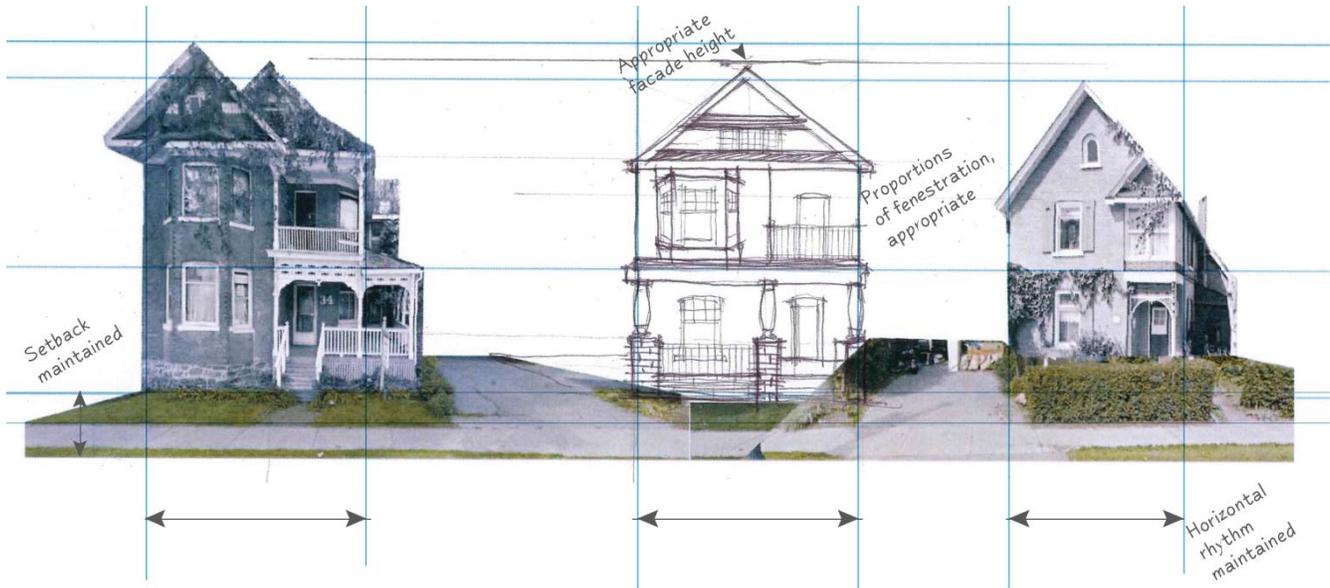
New Building Proportions, Height, Setback, and Style, Example is Supported. Example of new building that uses details from Edwardian Style, while also considering and respecting existing setbacks, pedestrian and vehicular access points, neighbouring buildings' façade height and composition and proportions of fenestrations.
